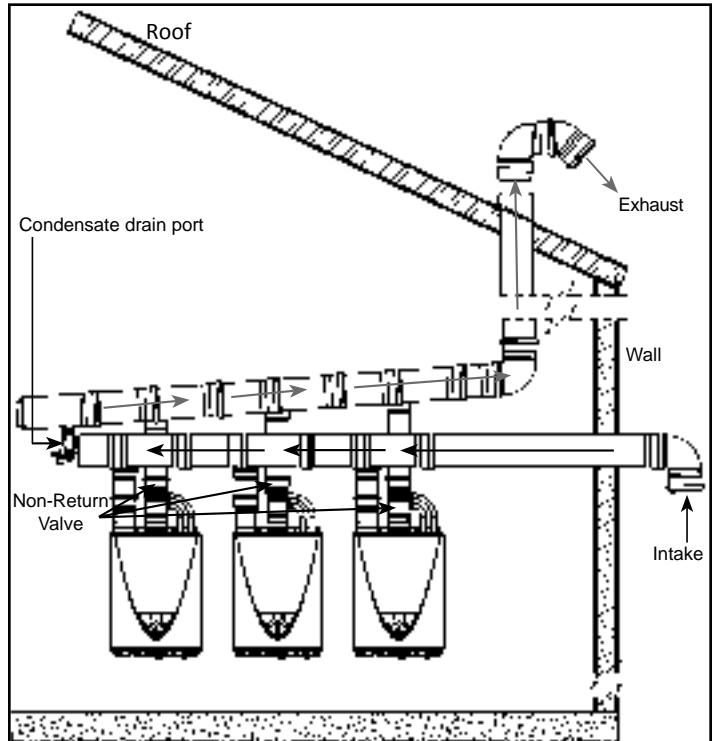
Typical Common-Vent Combination Wall / Roof Installation
